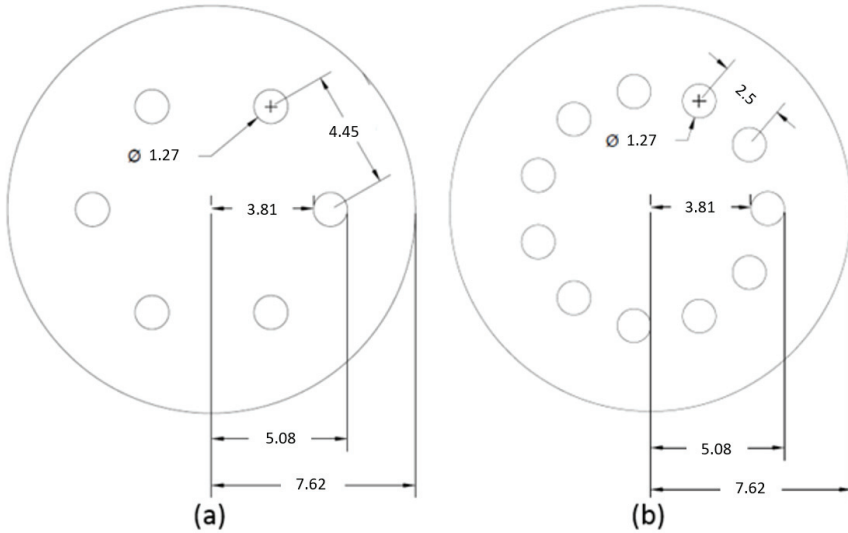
Specimens' layout of (a) Mortar + 6 steel rebars (b) Mortar + 11 steel rebars (Dimensions are in cm)
